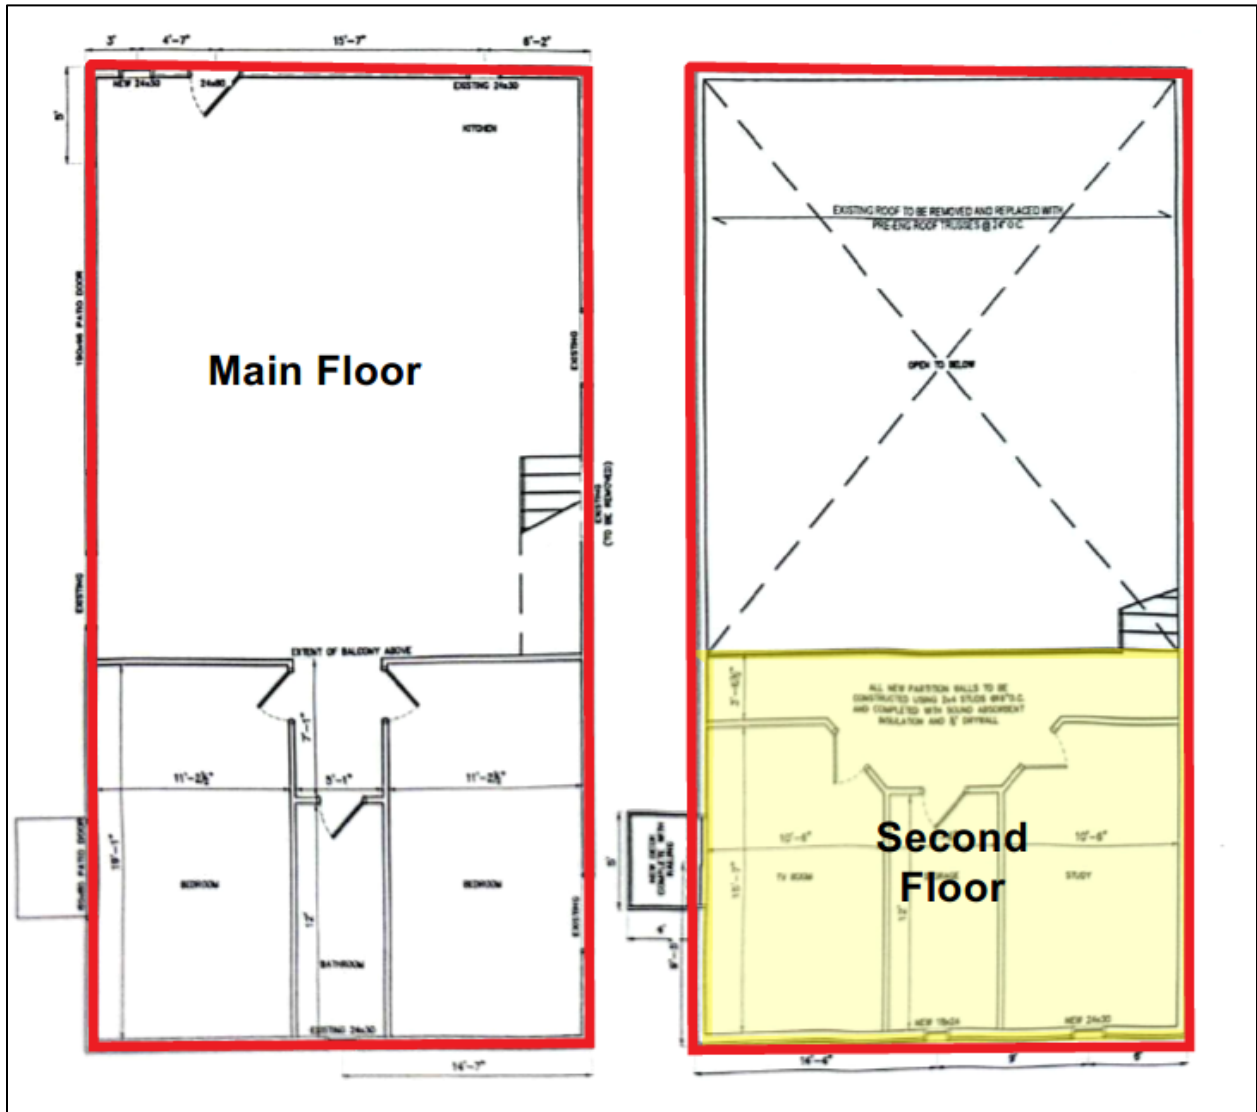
Plans submitted with the application showing the footprint of the enlarged dwelling (red outline) and the upper floor area (yellow area).
